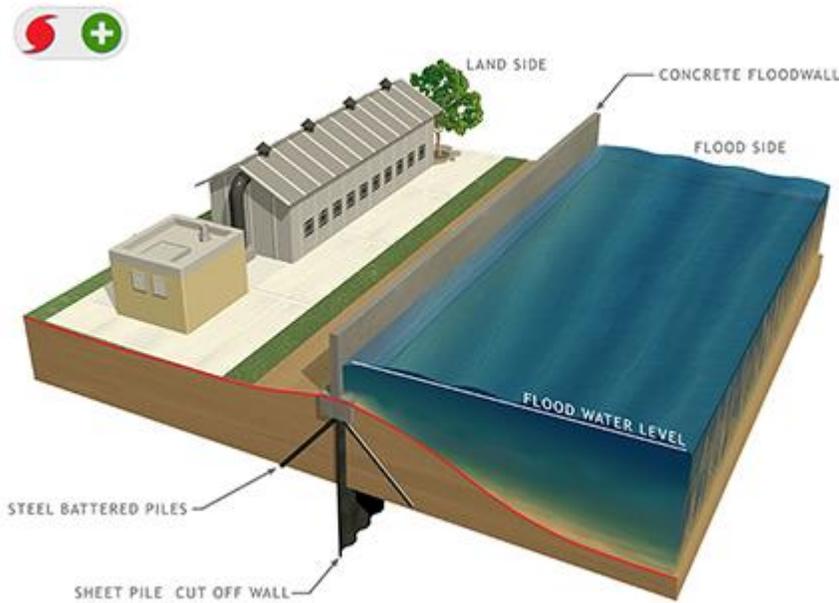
Example of a Type B/C Floodwall (NACCS)
